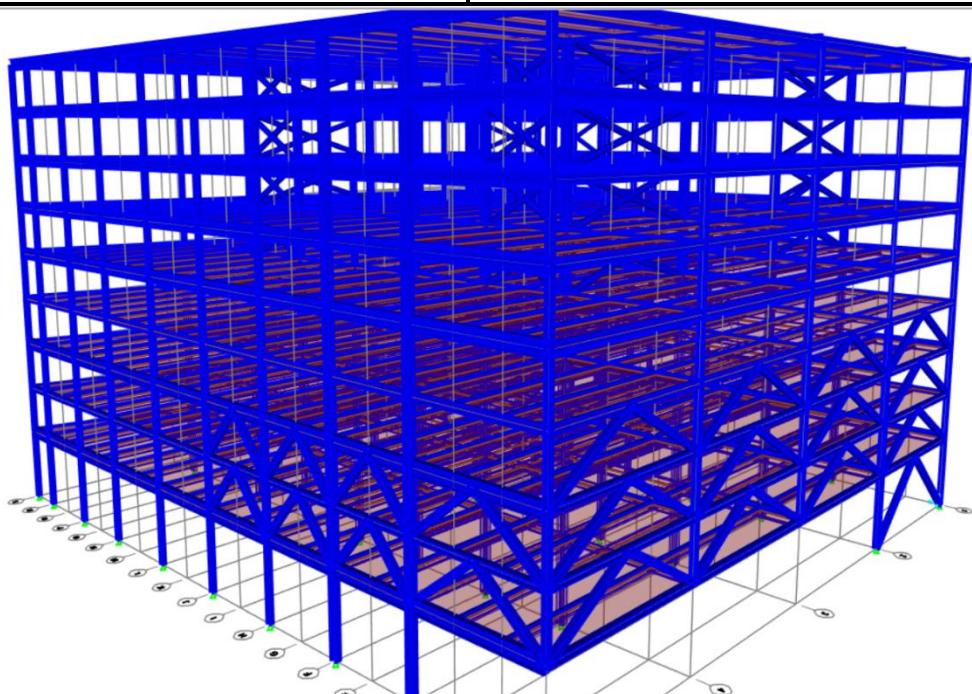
Global Structural Model for Proposal 2 (SAP2000)
